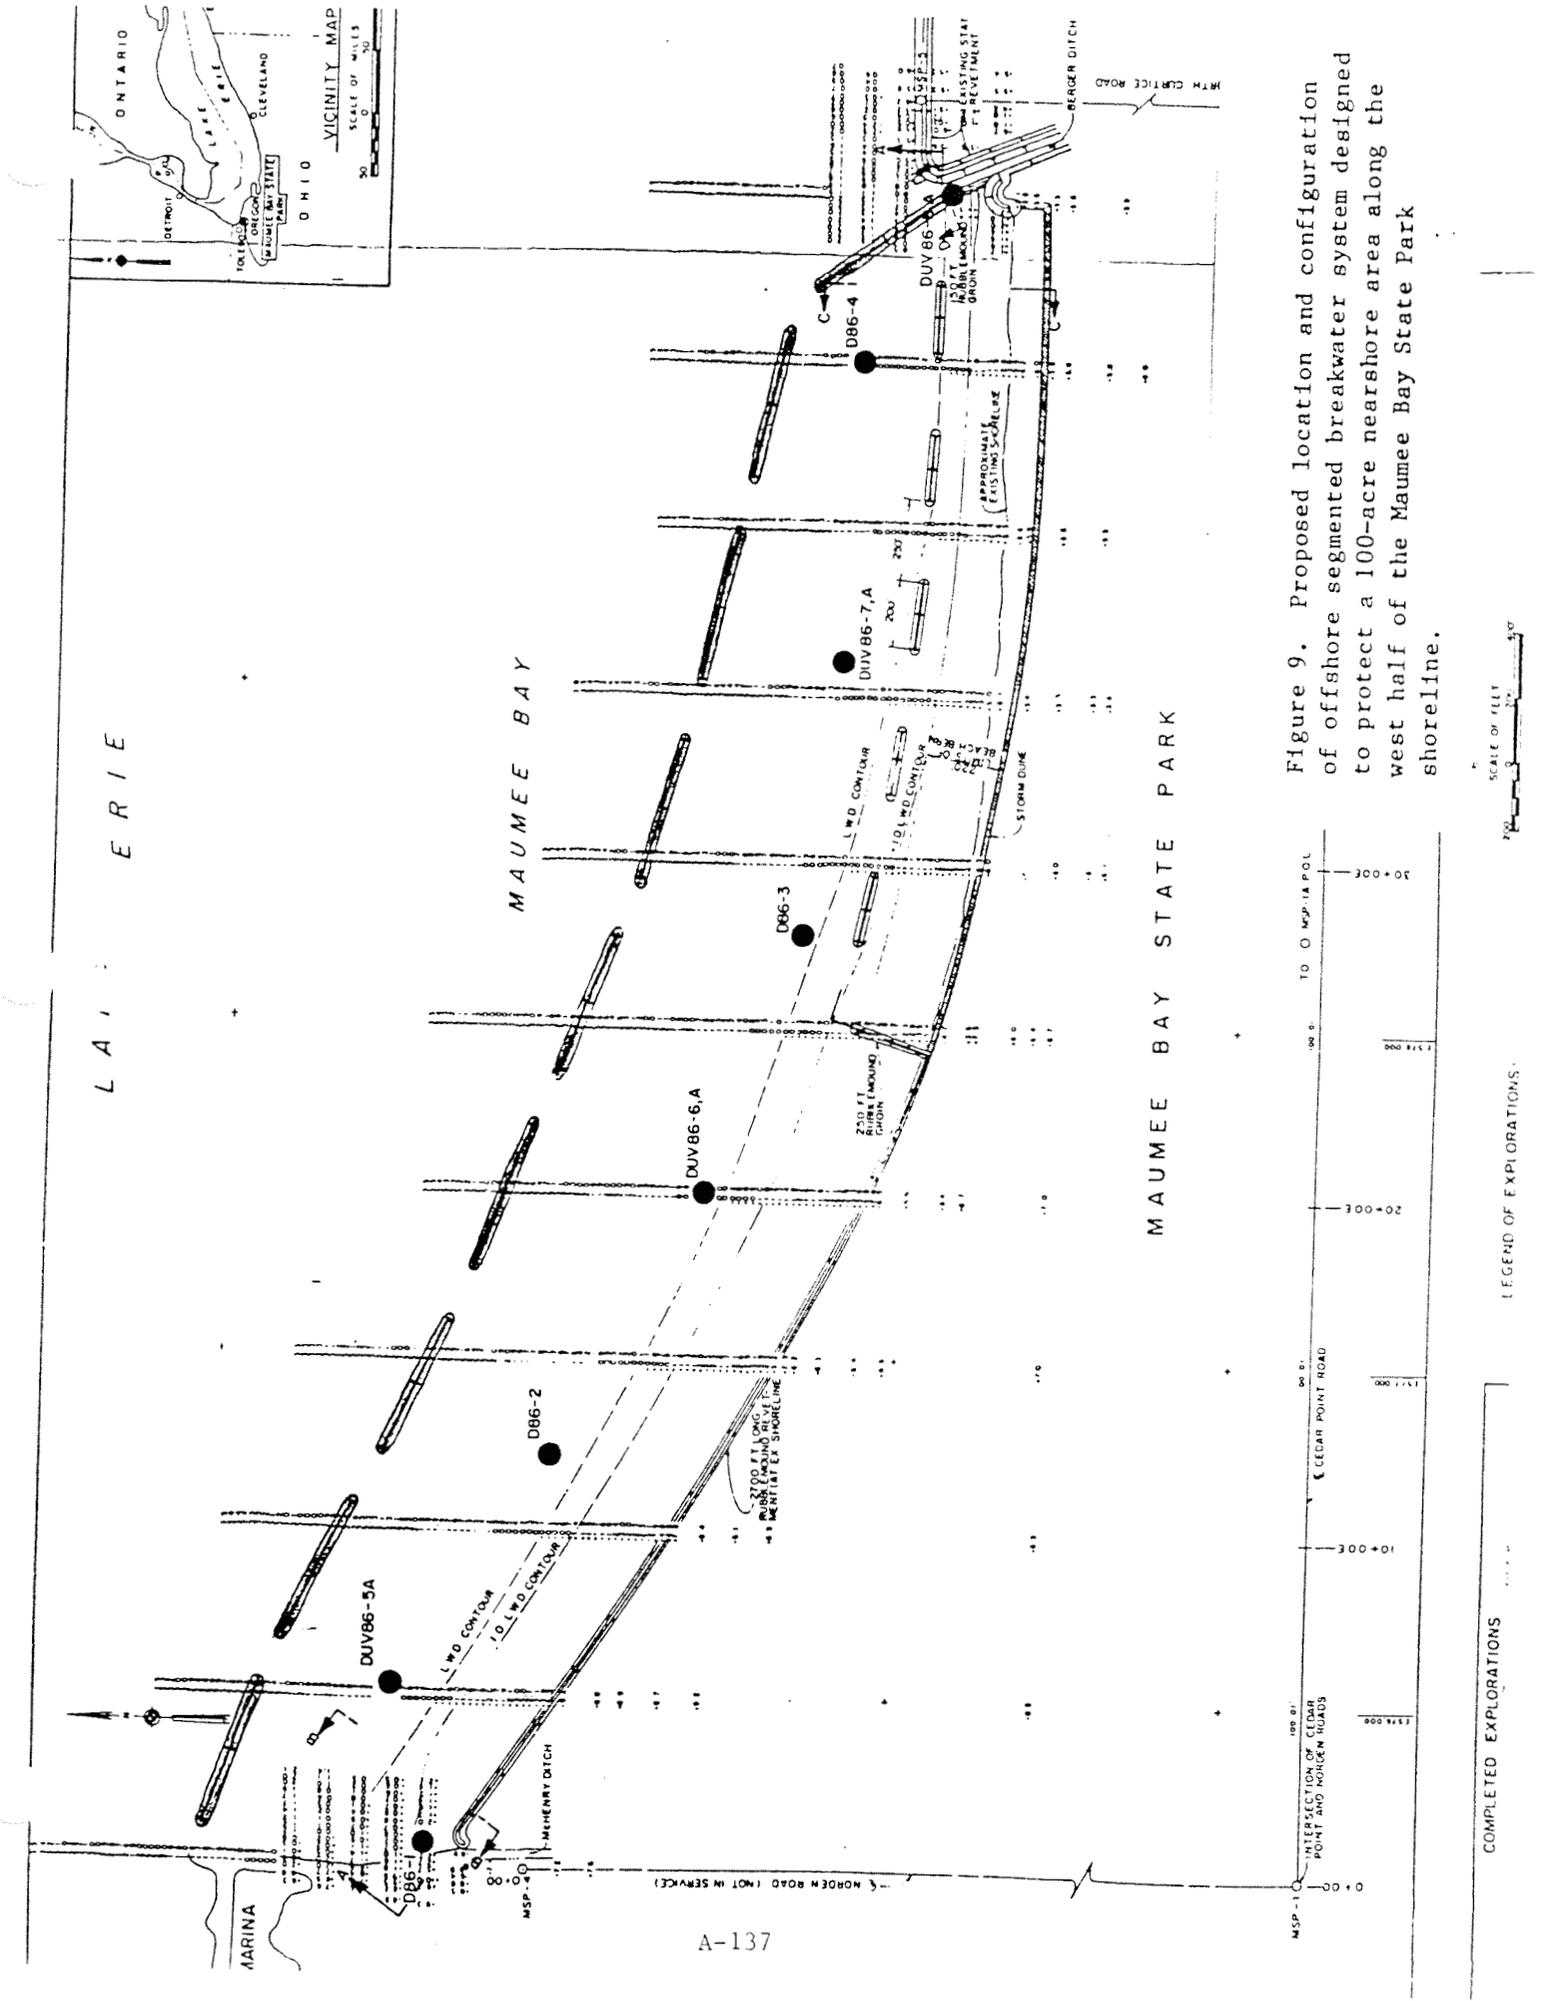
Proposed location and configuration of offshore segmented breakwater system designed to protect a 100-acre nearshore area along the west half of the Maumee Bay State Park shoreline.
